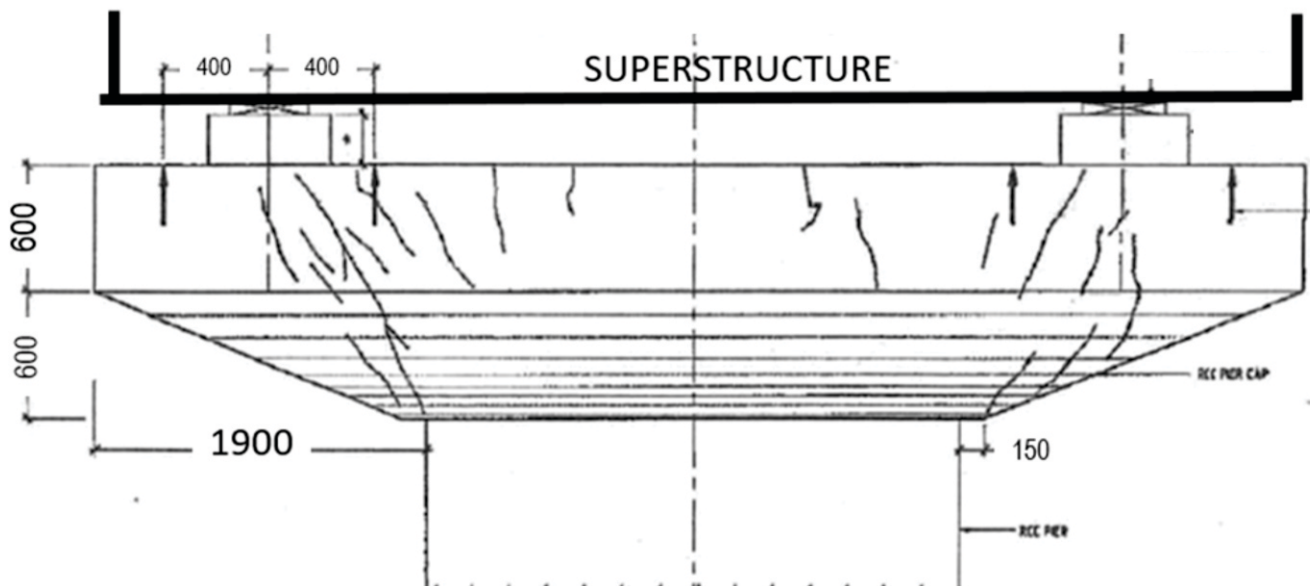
Cracks in Pier Cap at P4 as Seen from Obligatory Span Side After its Erection.
